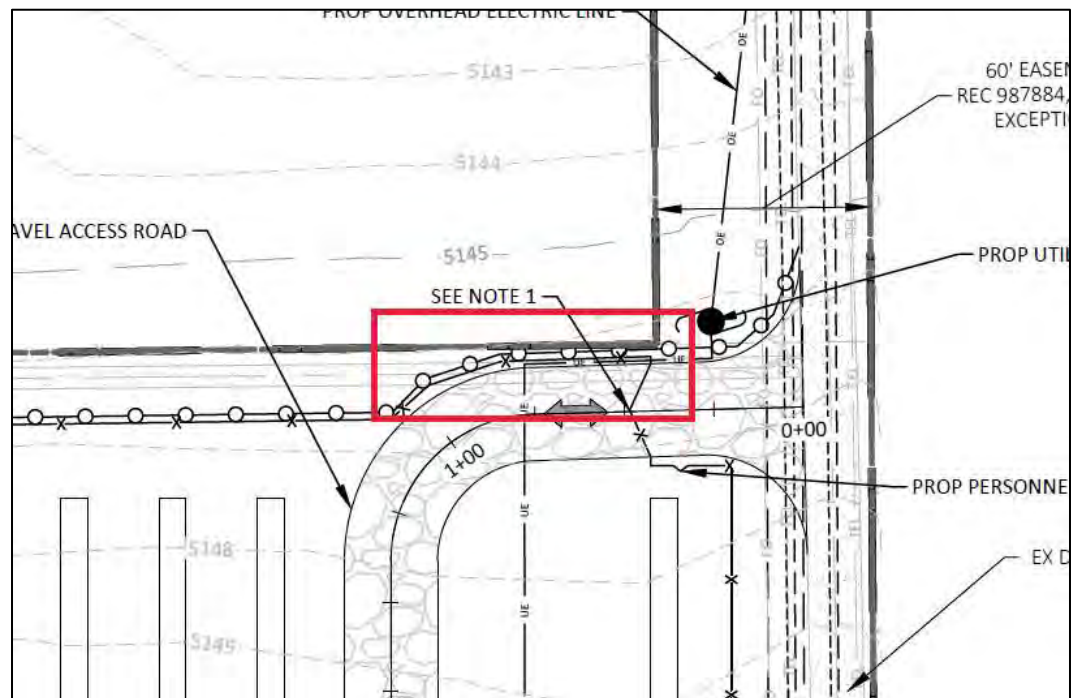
Detail from proposed site plan, with section of fencing located in the required setback indicated in red.
